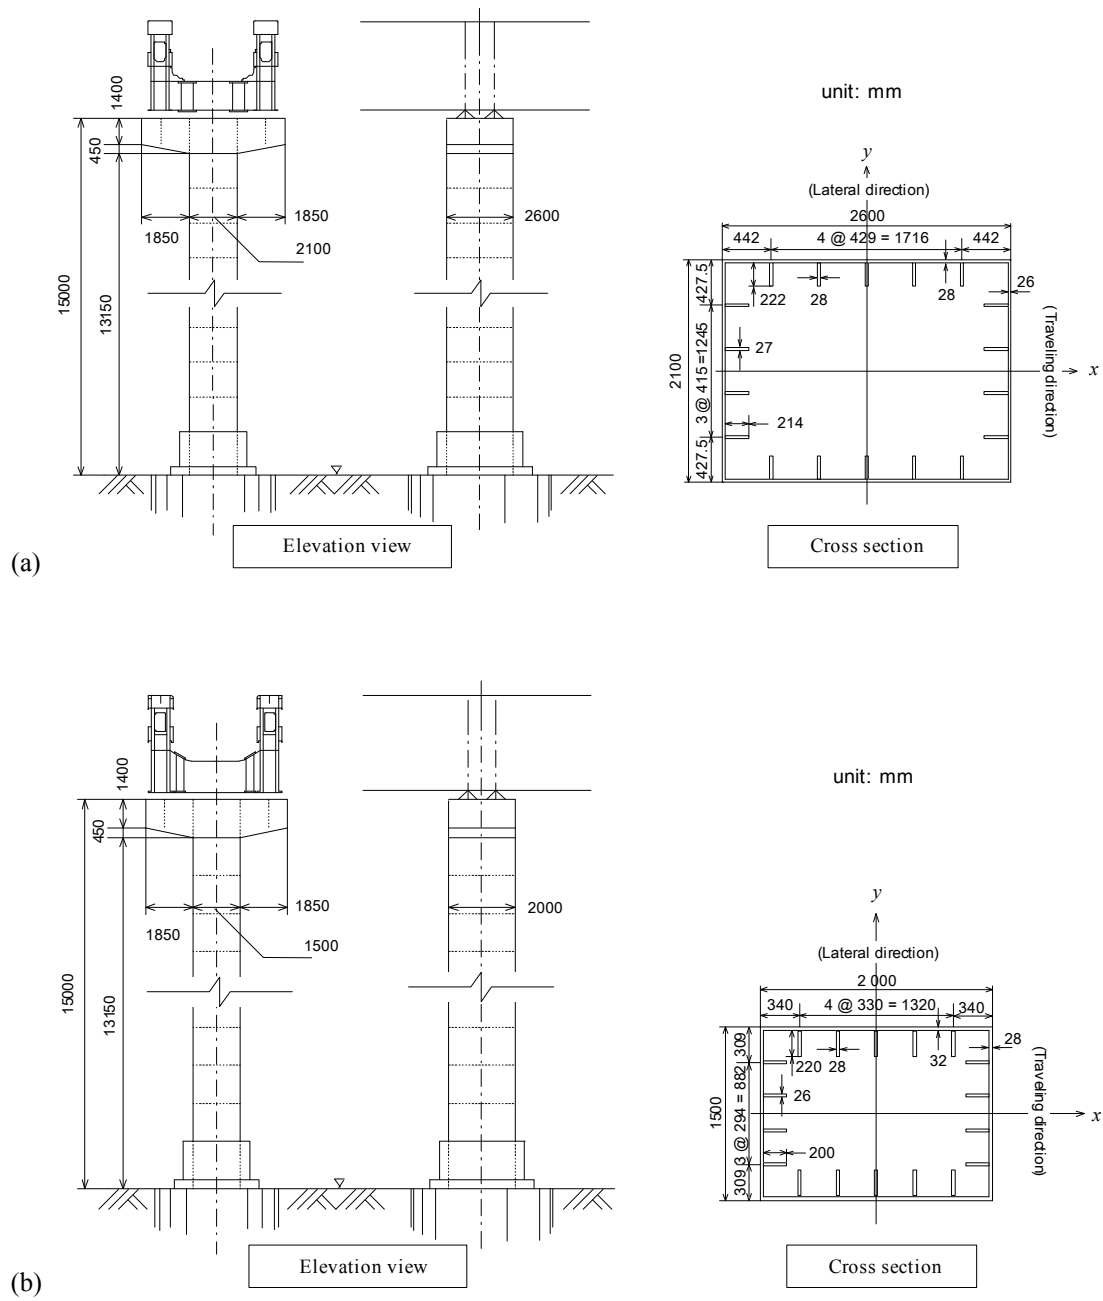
Configuration of steel piers: (a) advanced bridge; and (b) conventional bridge.
